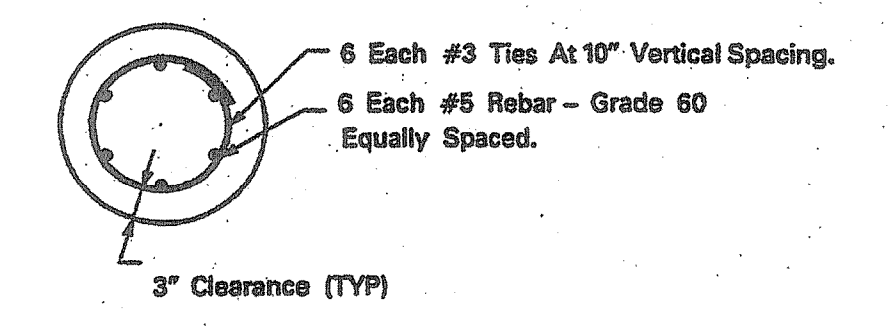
Reinforcement Detail - Section "A-A" (See Figure 1)
